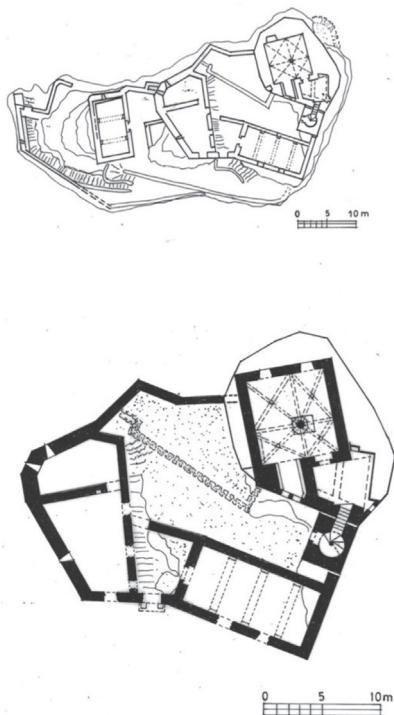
Plan of Quéribus castle (Lucien Bayrou)
